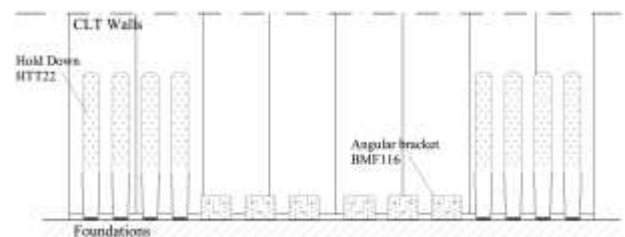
Multiple connectors at foundation level are represented in the drawing on one side of the CLT wall
